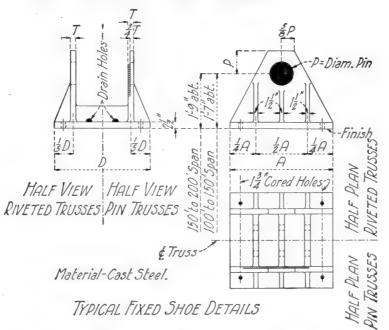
SHOE DETAILS. CHICAGO, MILWAUKEE & ST. PAUL RY.
